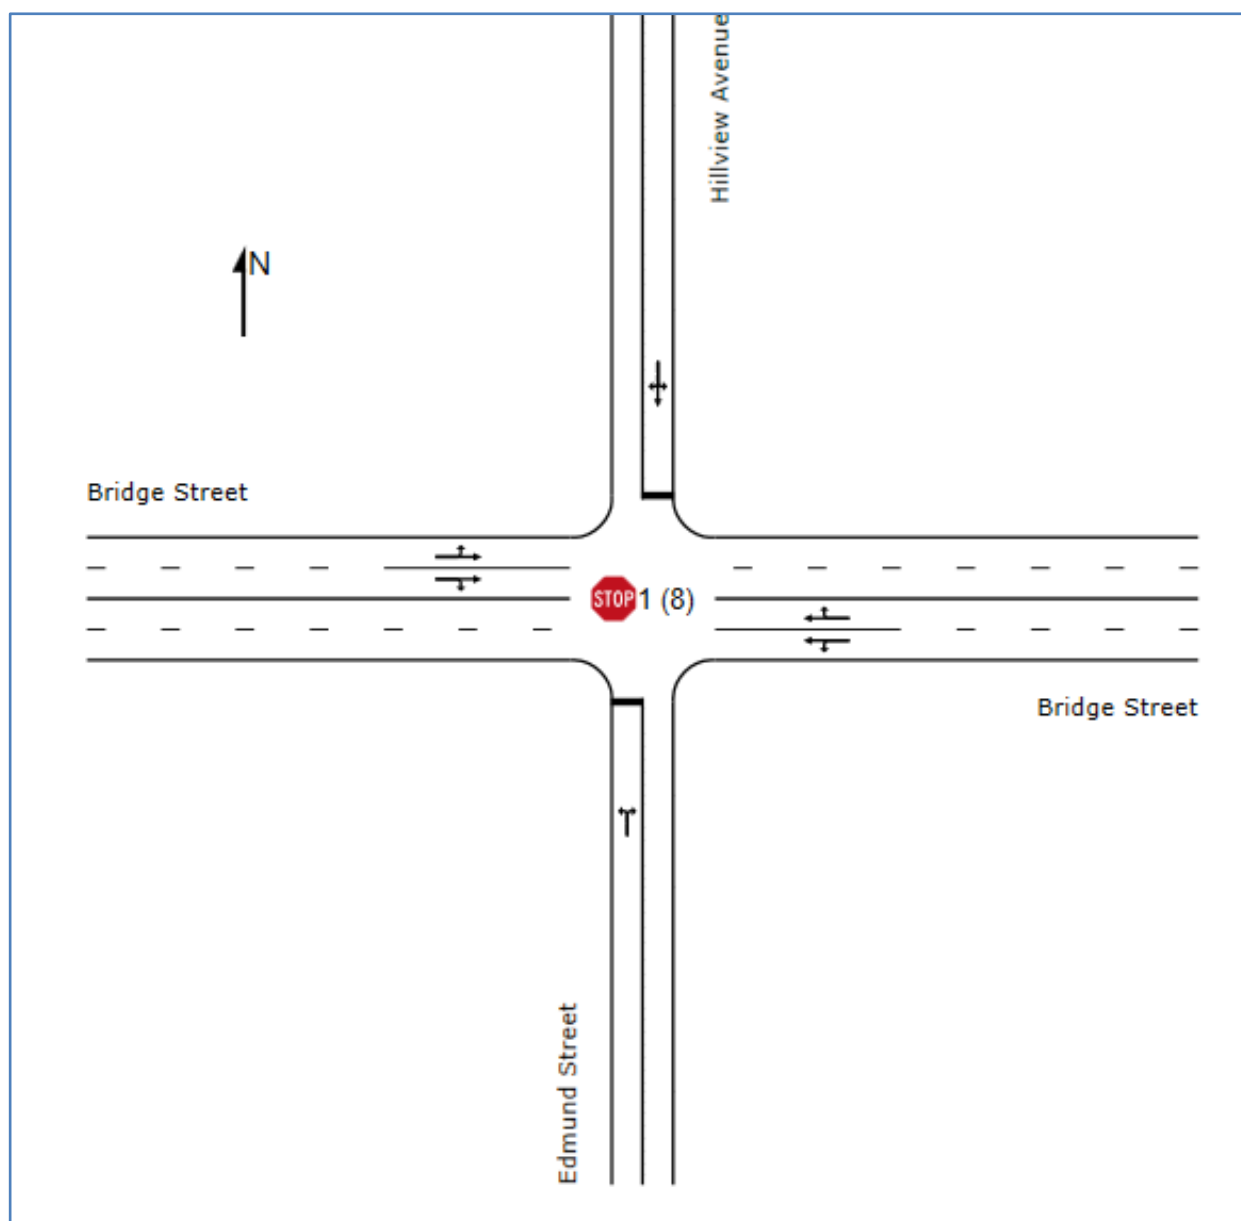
Hillview Avenue / Bridge Street / Edmund Street intersection– SIDRA Layout
